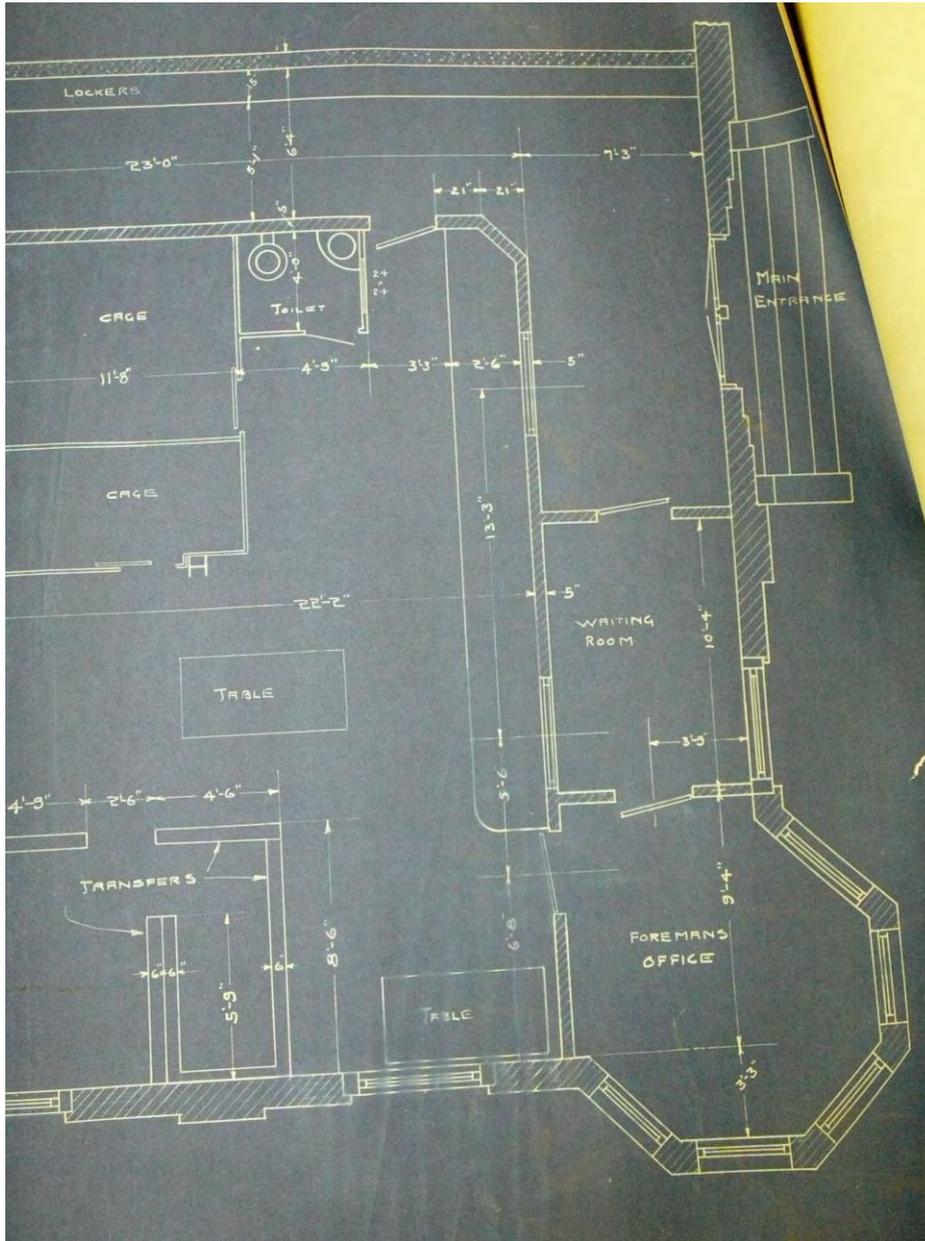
First floor plans, southern portion, former main entrance and foreman's office, source: Northwest Architectural Archives
